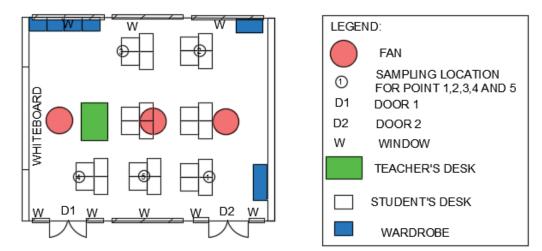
Floor plan at Level 2 of SK Machang Bubok
